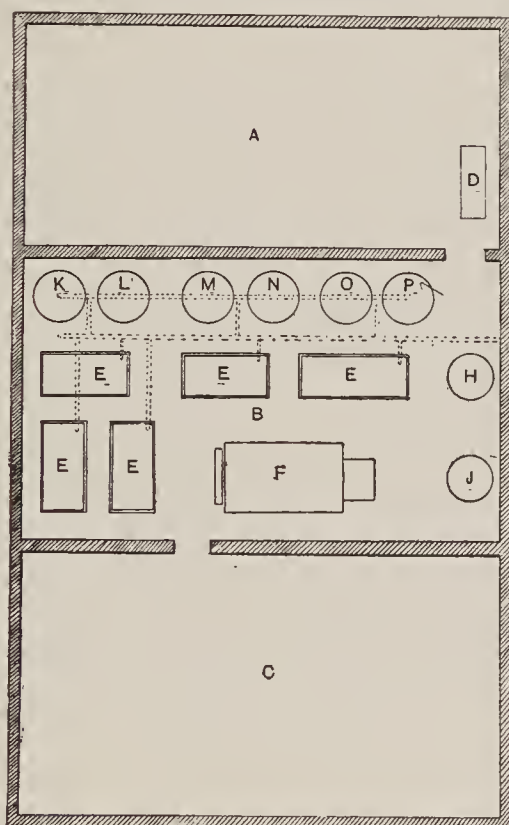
Plan of bale room, washing house, and conditioning floor.
